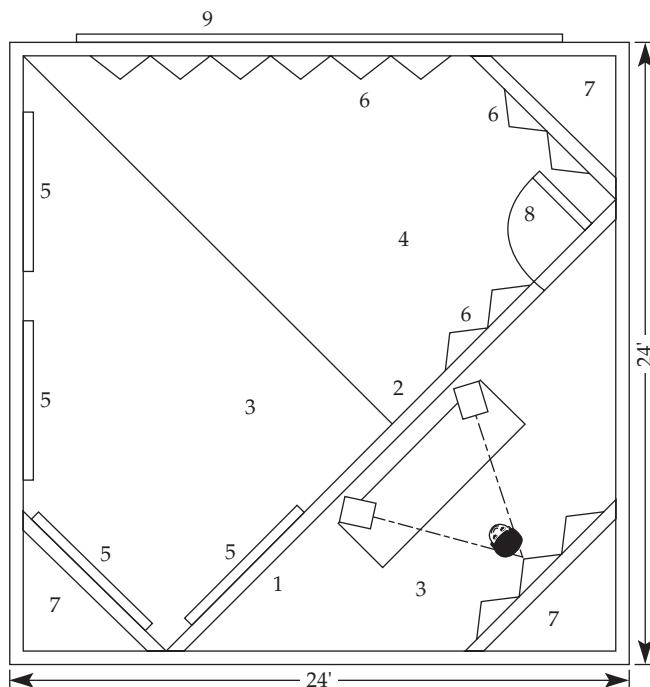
Floor plan of a garage studio with separate control room and studio.
